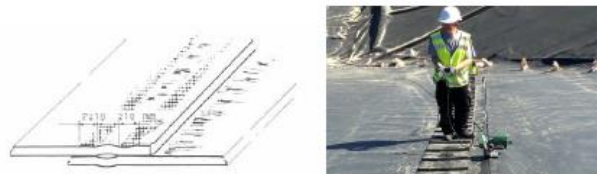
Double welding of a HDPE liner and a welding machine in action (Jensen et. al 2015)
